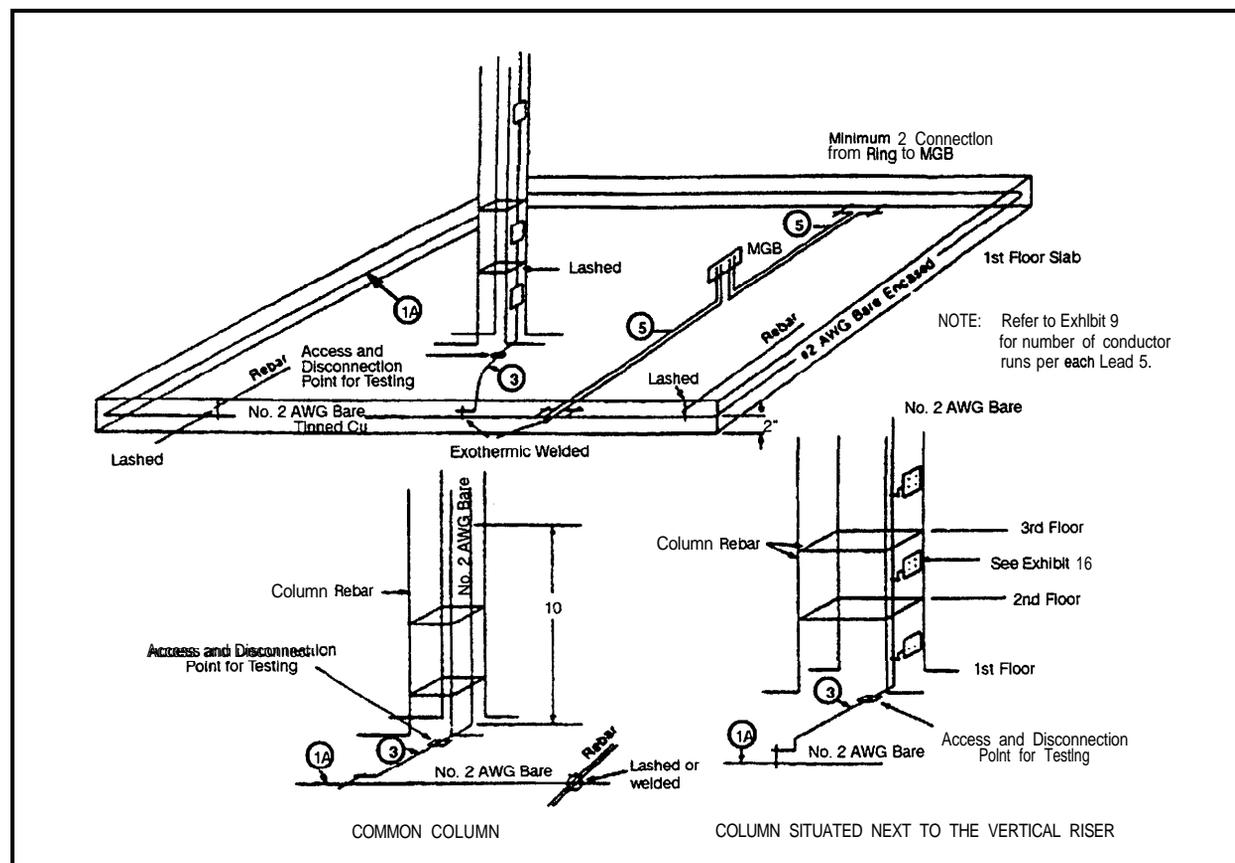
Concrete-Encased Electrode in a Building with Steel-Reinforced Concrete Columns
